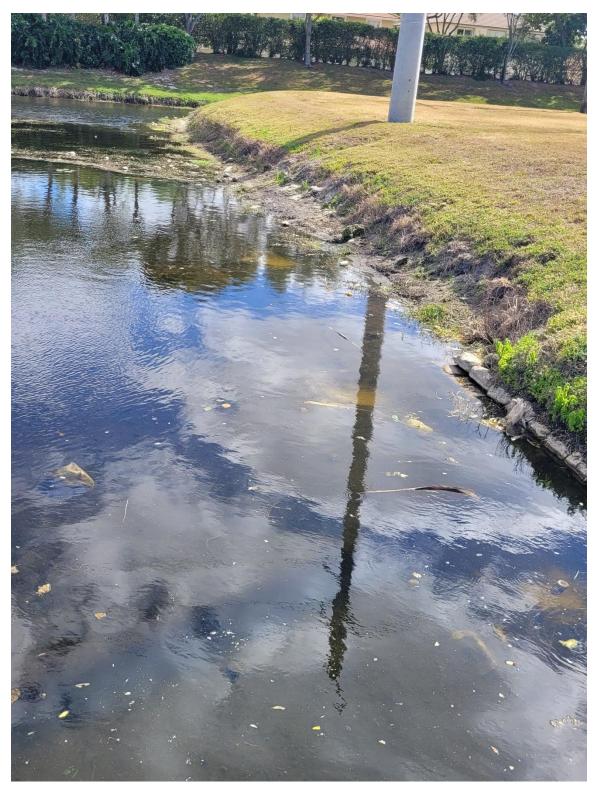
West bank of canal section at Sheridan Street and the 7300 block, looking south. The photo indicates the erosion of approx. 135-feet of the west bank.
